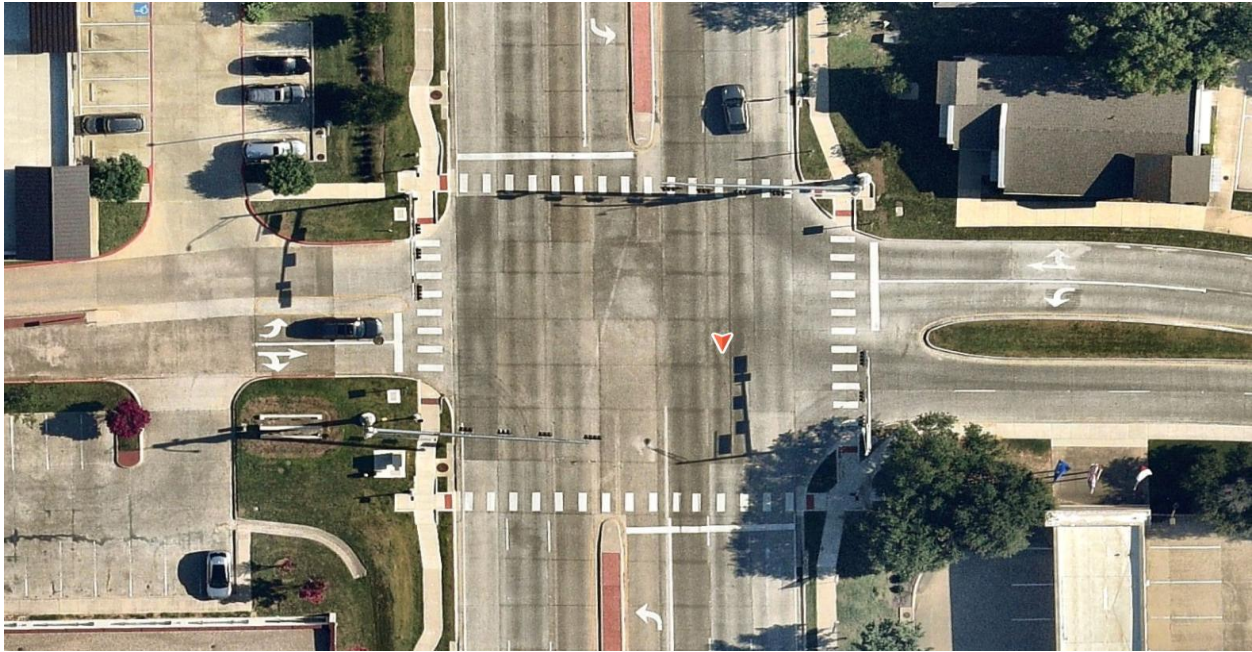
Part B: Teasley Ln at Sundown Blvd – View of Intersection Improvements (After Installation)
